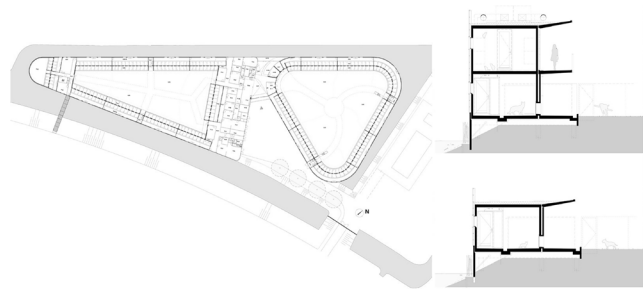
The Animal Refuge Centre, building ground floor plan and sections (Image courtesy of Arons en Gelauff Architecten).
